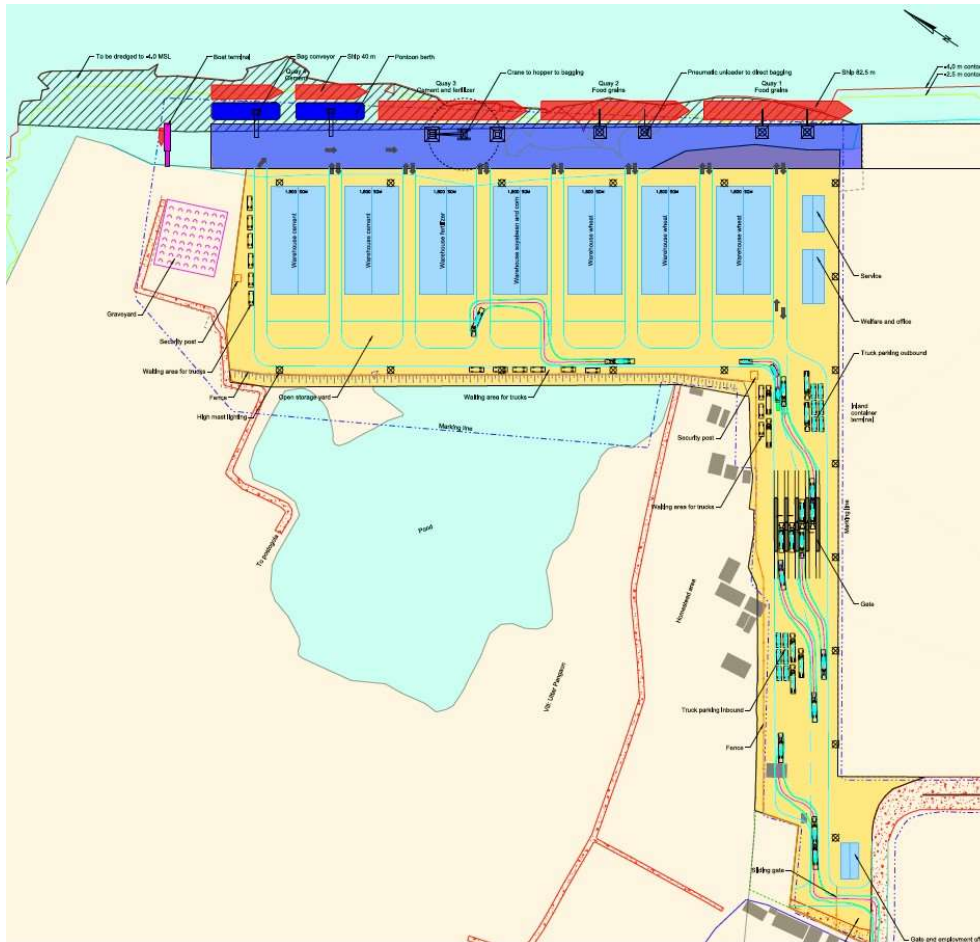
Proposed Master Plan Layout of Pangaon Cargo Terminal.
